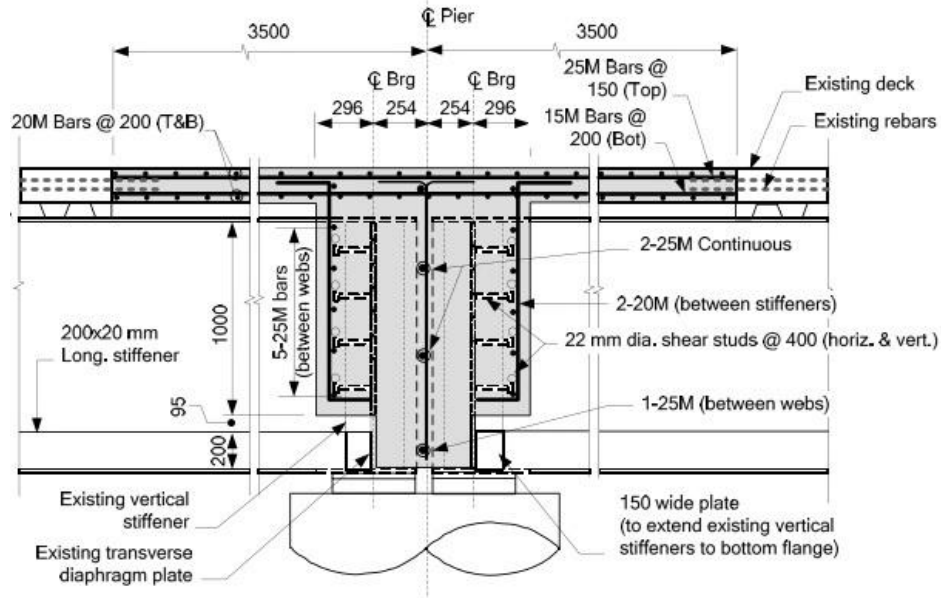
Semi-Continuous deck system details (Lam et al., 2008)
